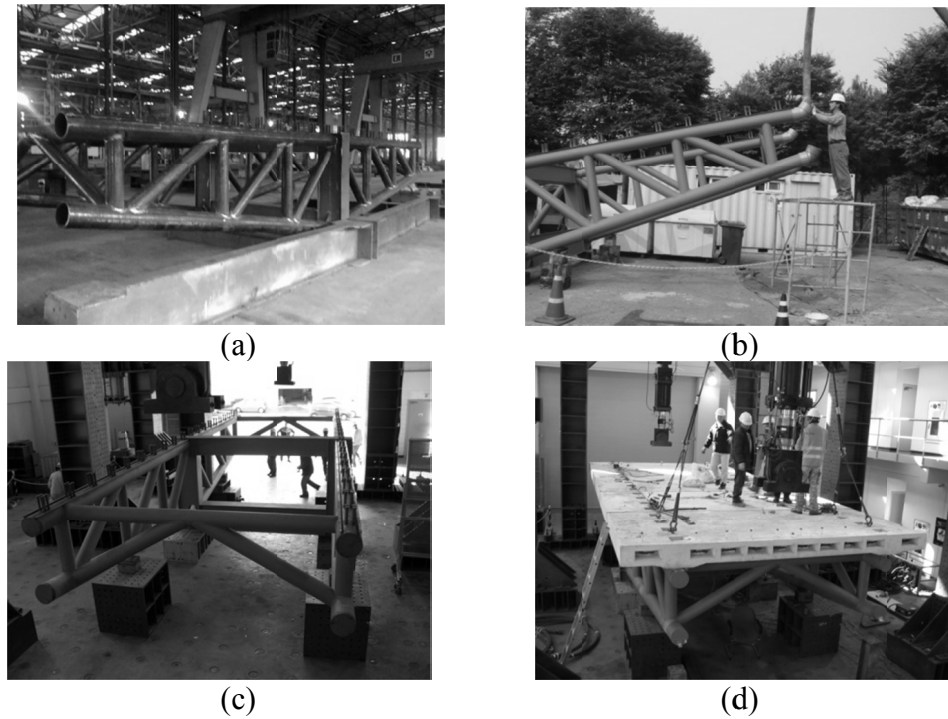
Manufacturing process of the experimental model for the testing of continuous supporting points of CFT truss girder bridges: (a) Production of girder; (b) Filling concrete into steel tube; (c) Setting girders; (d) Combining precast deck.
